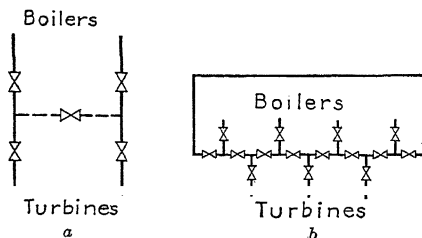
a*, The unit boiler-turbine system; *b*, the ring-header system.
